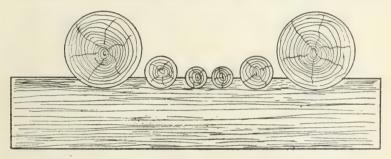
SIX POLE TIMBER CHUTE. SCALE § inch = I foot.
